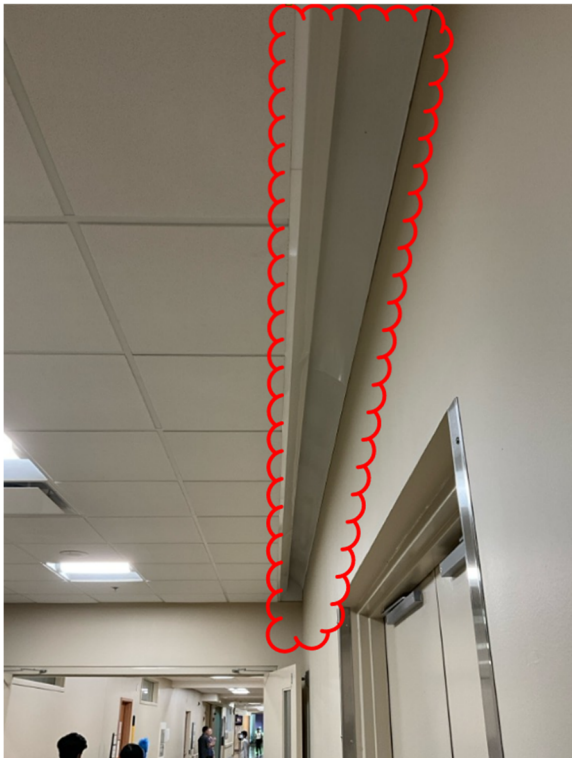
Corridor 1F123 abandoned cove lightings
